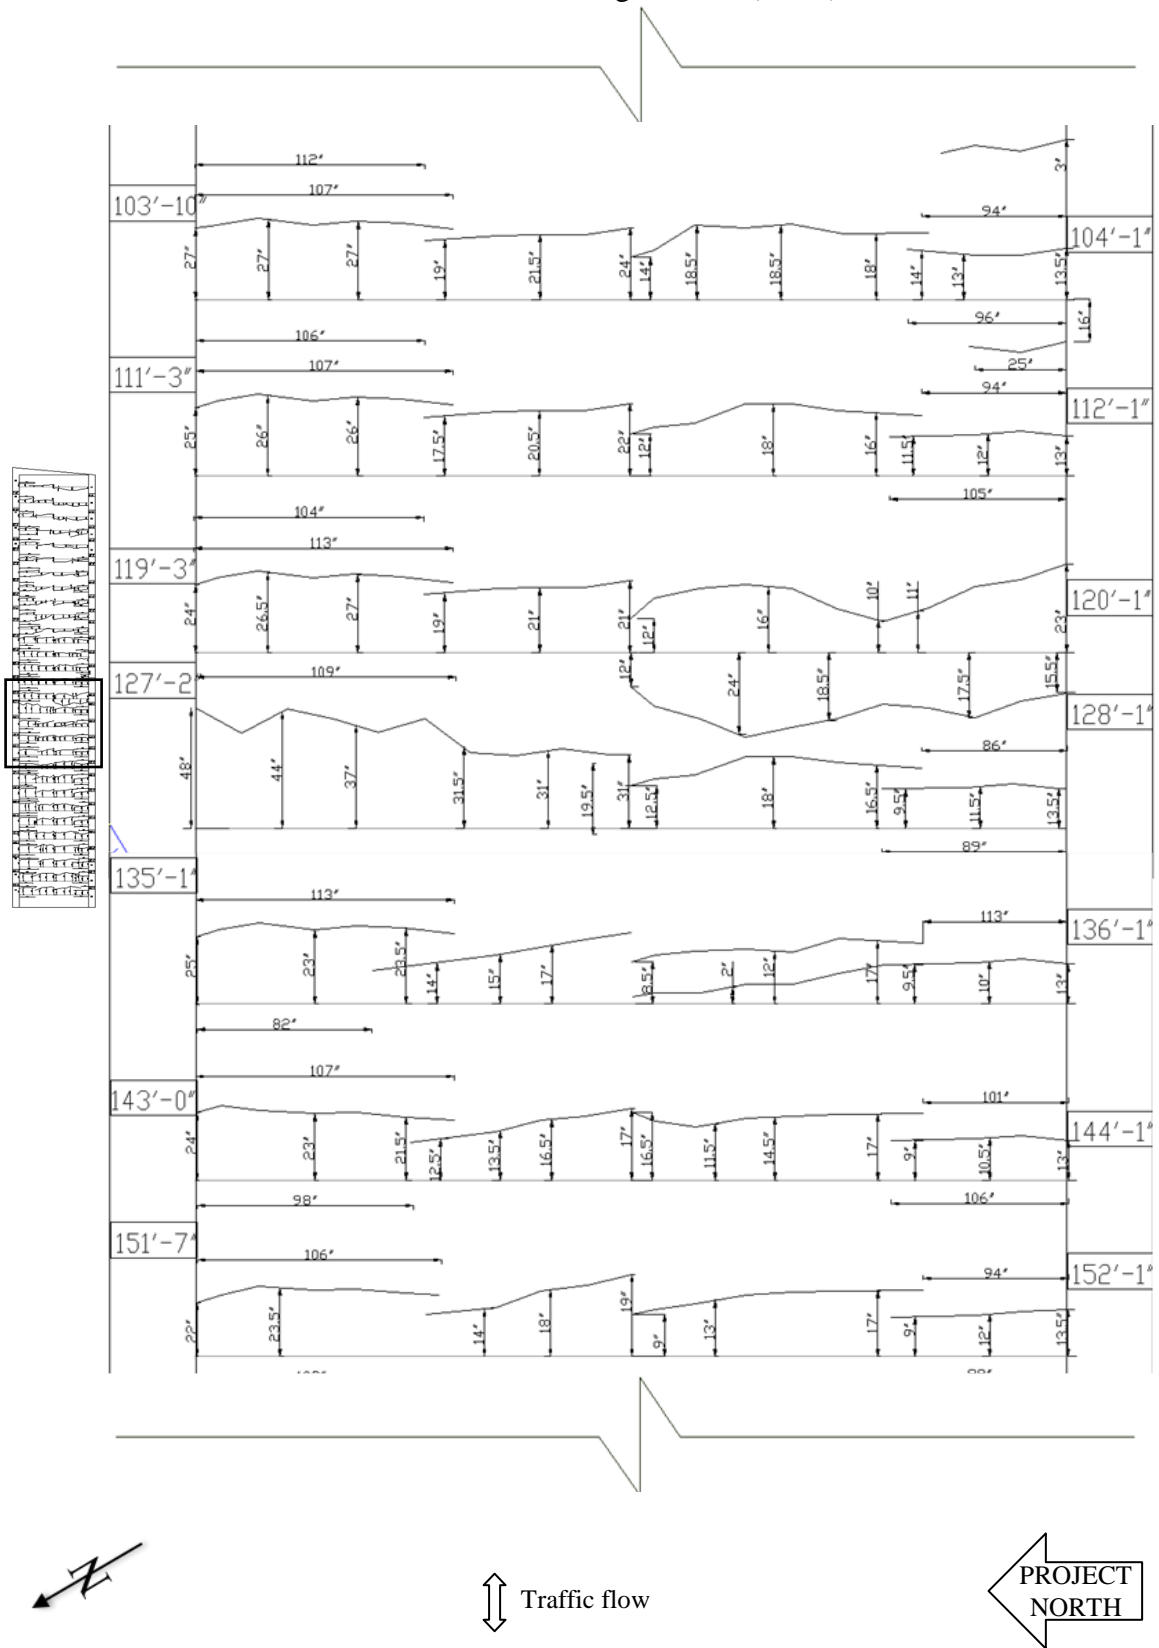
Visual Inspection Data from the Top Surface of the Bridge Deck - Crack Map and Drain Locations – Bridge A4709 (Cont.)
